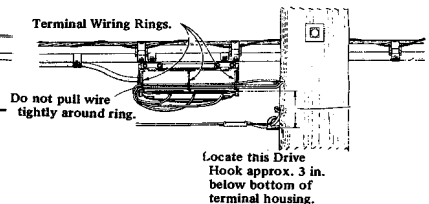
Rear View of Running Wires to Terminal from Drive Hooks
